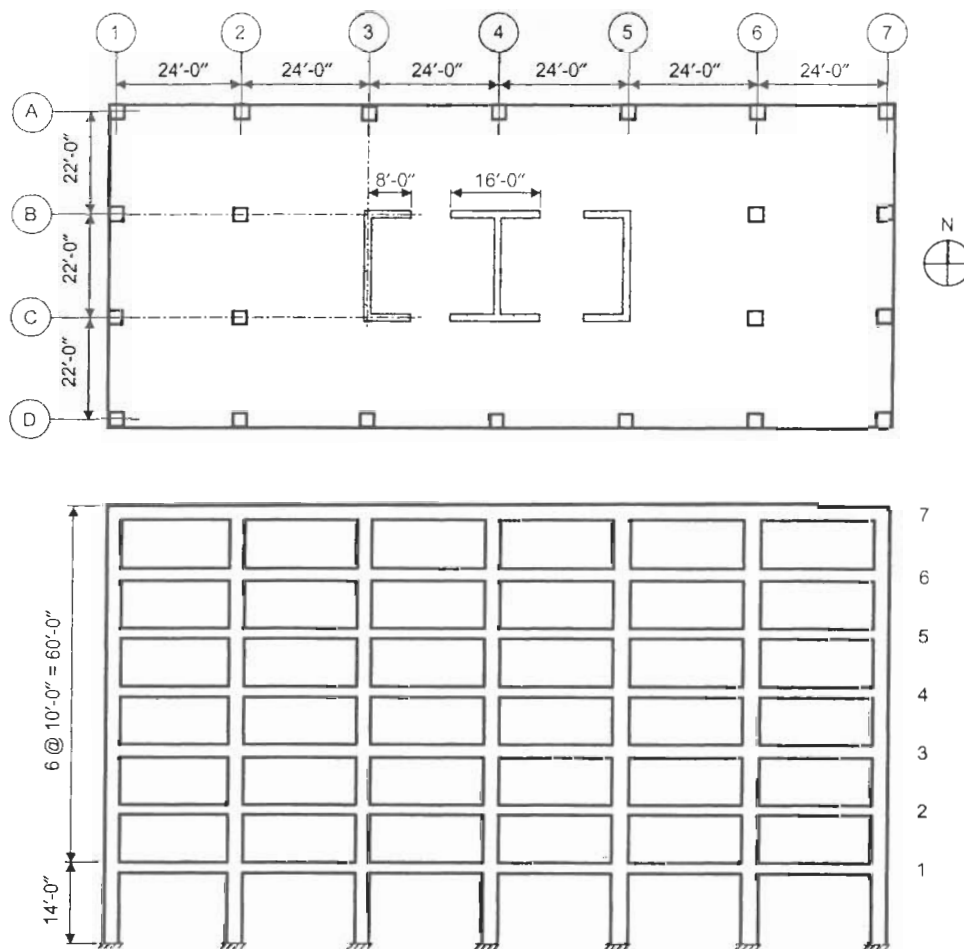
Typical Plan and Elevation of Example Building (SDC D)
